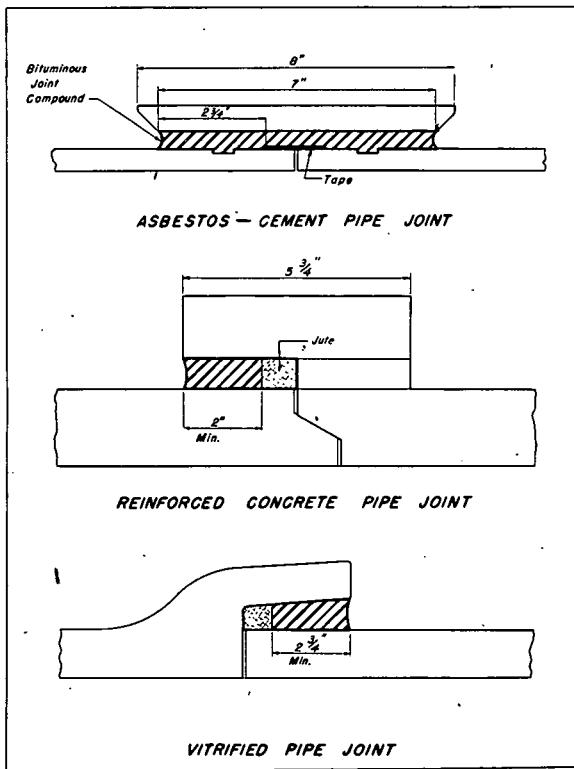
TYPICAL JOINTS FOR SEWER PIPE
